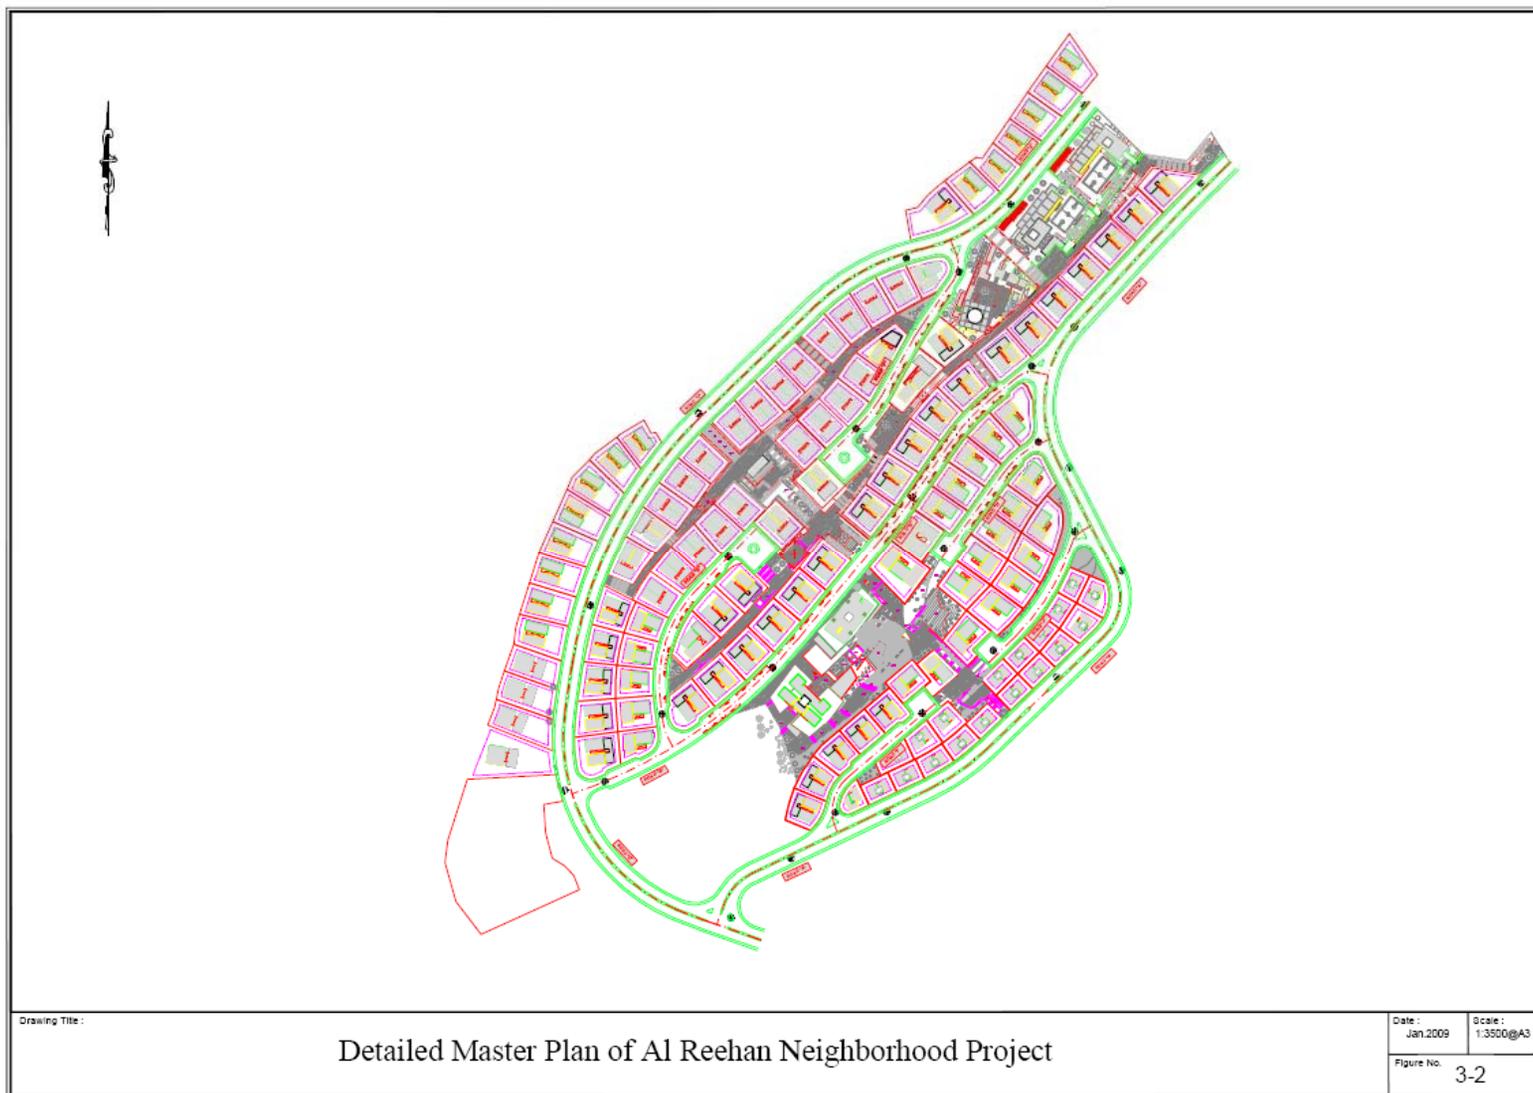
Detailed Master Plan of Al Reehan Neighborhood Project
